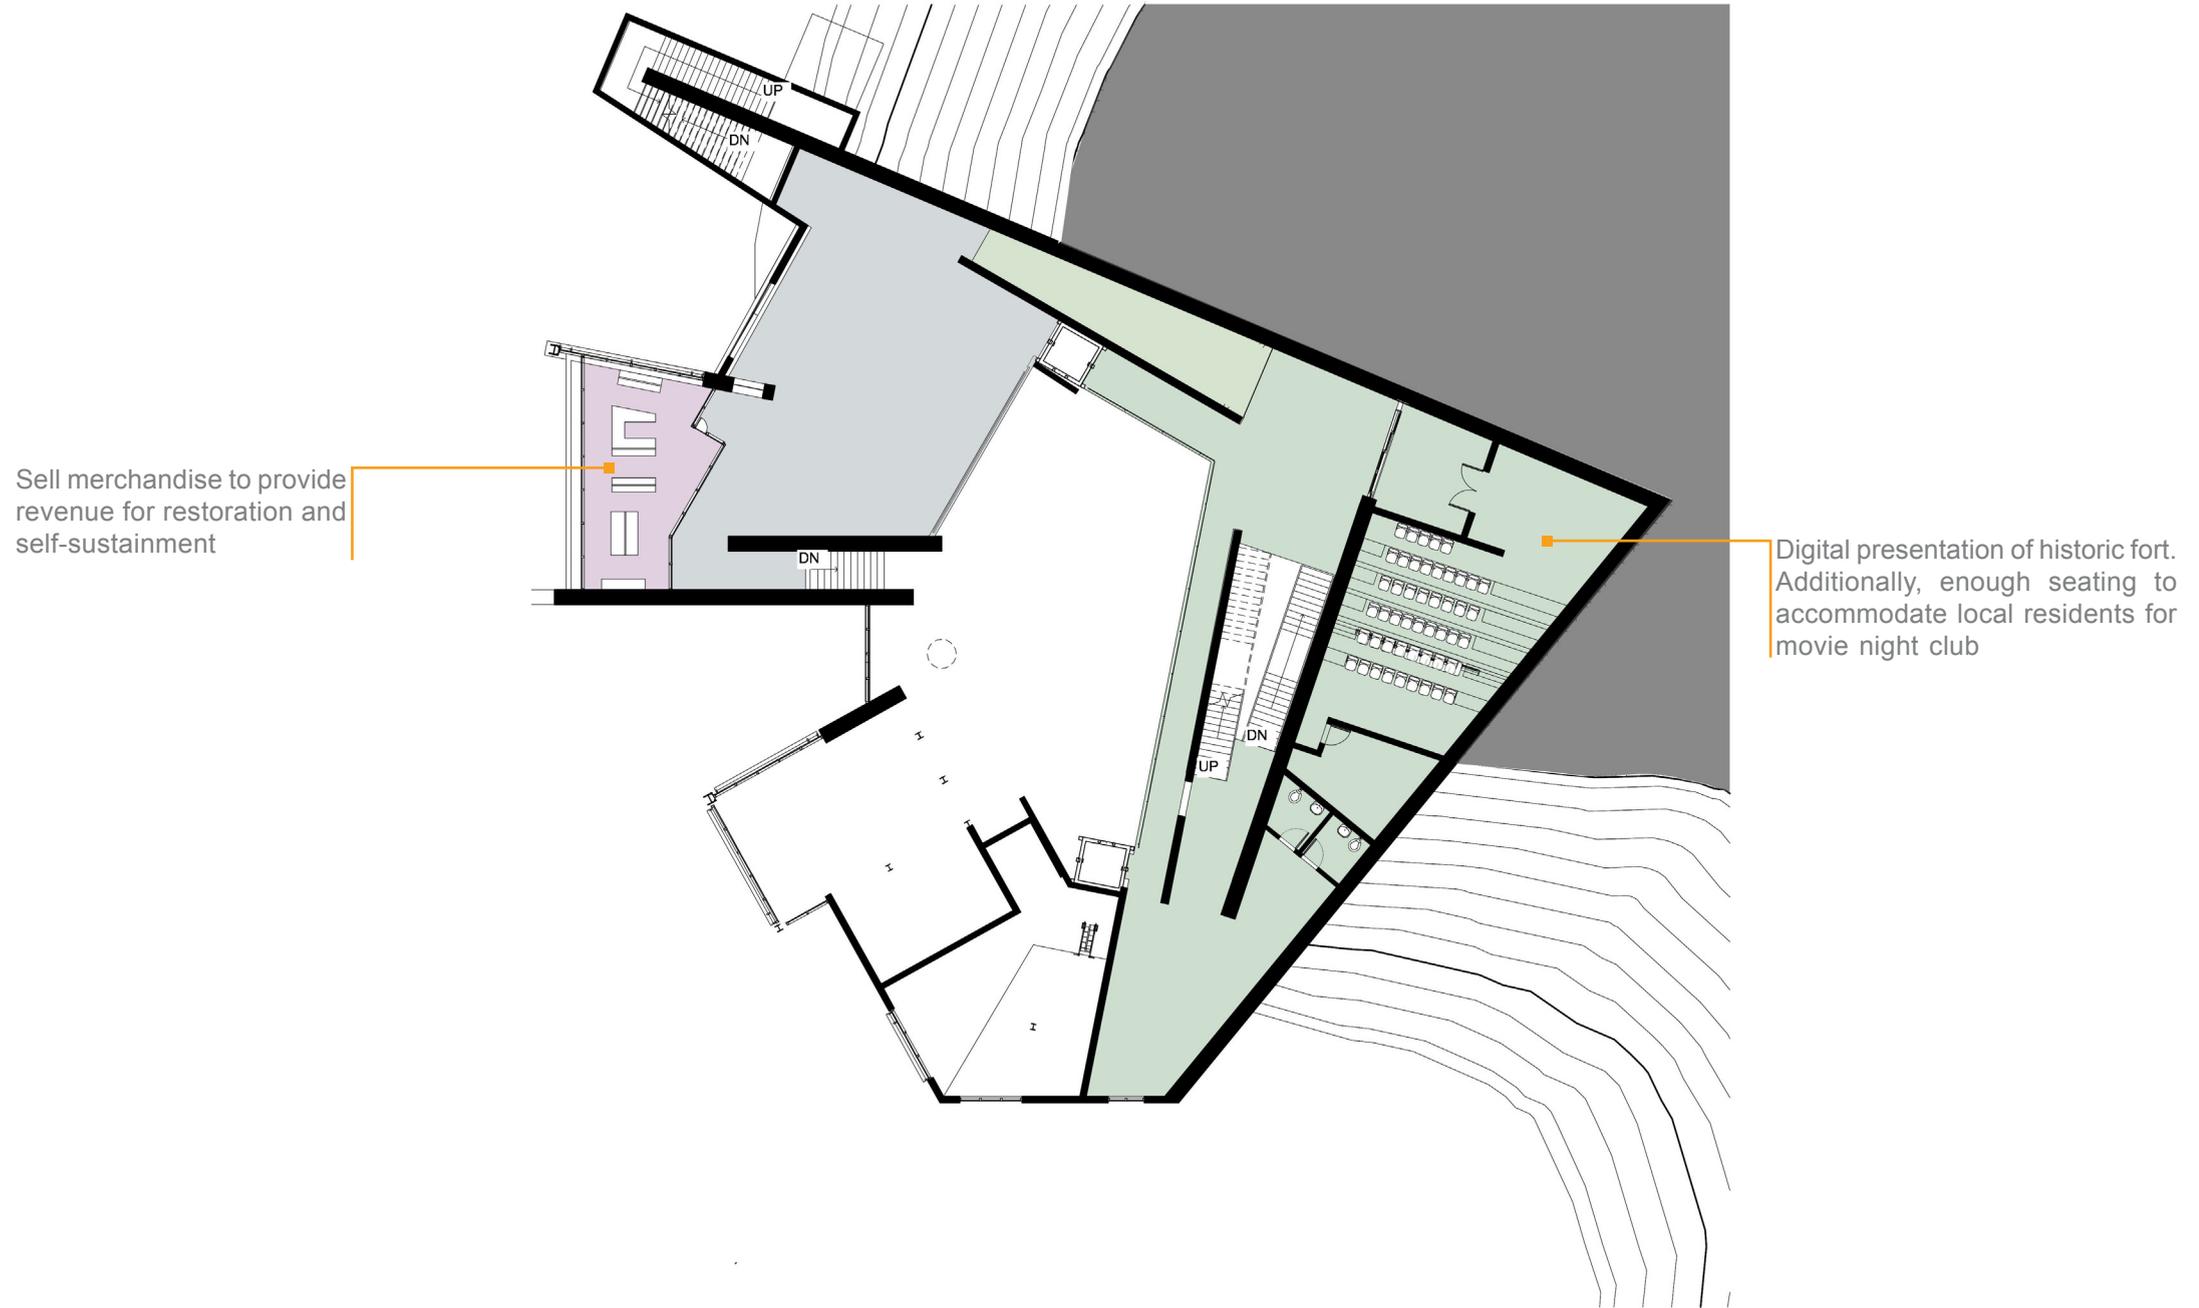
Fort Washington, MD new site plan. Adaptation (Microsoft).
